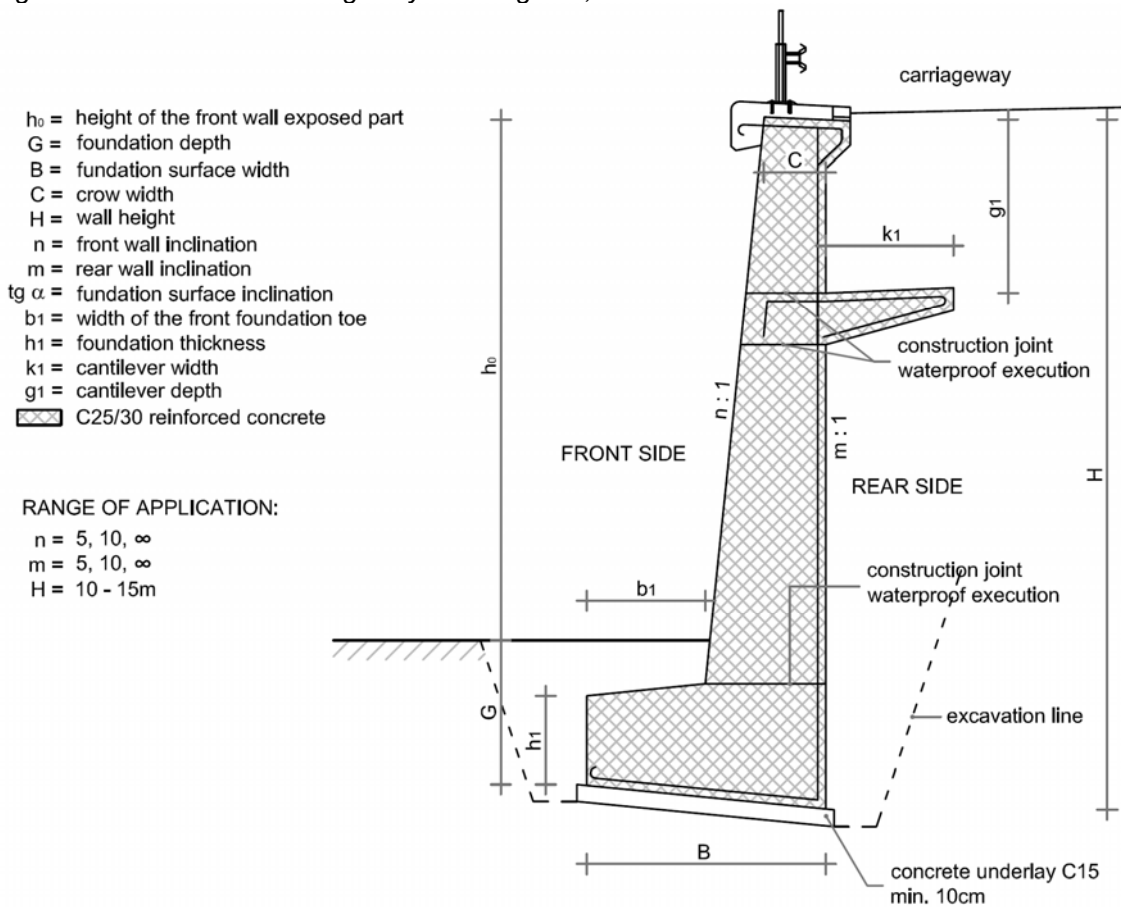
Reinforced concrete gravity supporting wall, with a rear cantilever
